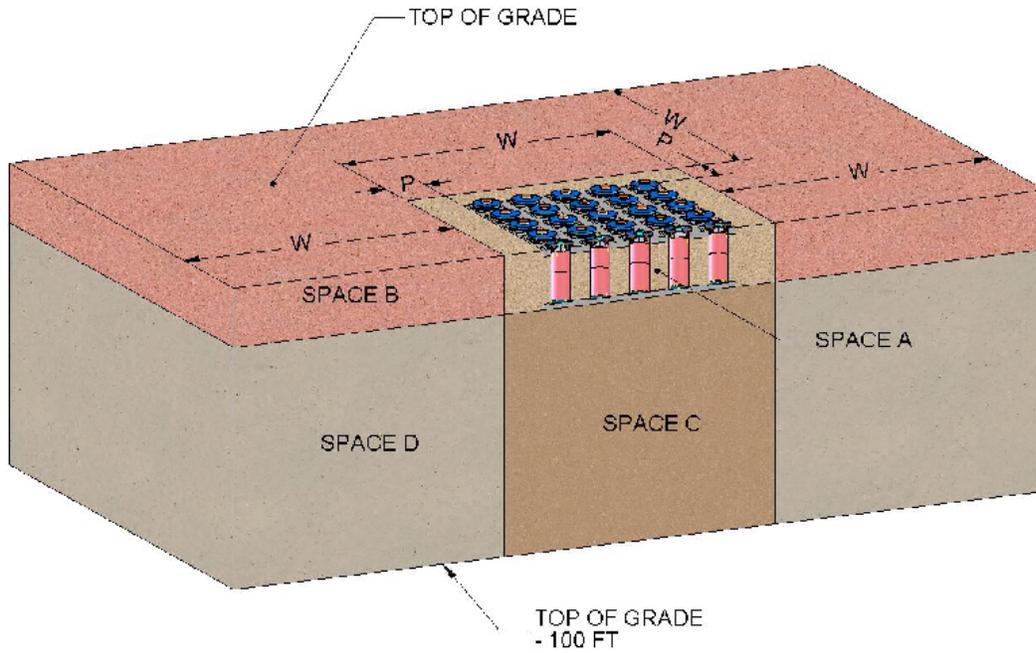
SUBGRADE AND UNDERGRADE SPACE NOMENCLATURE
